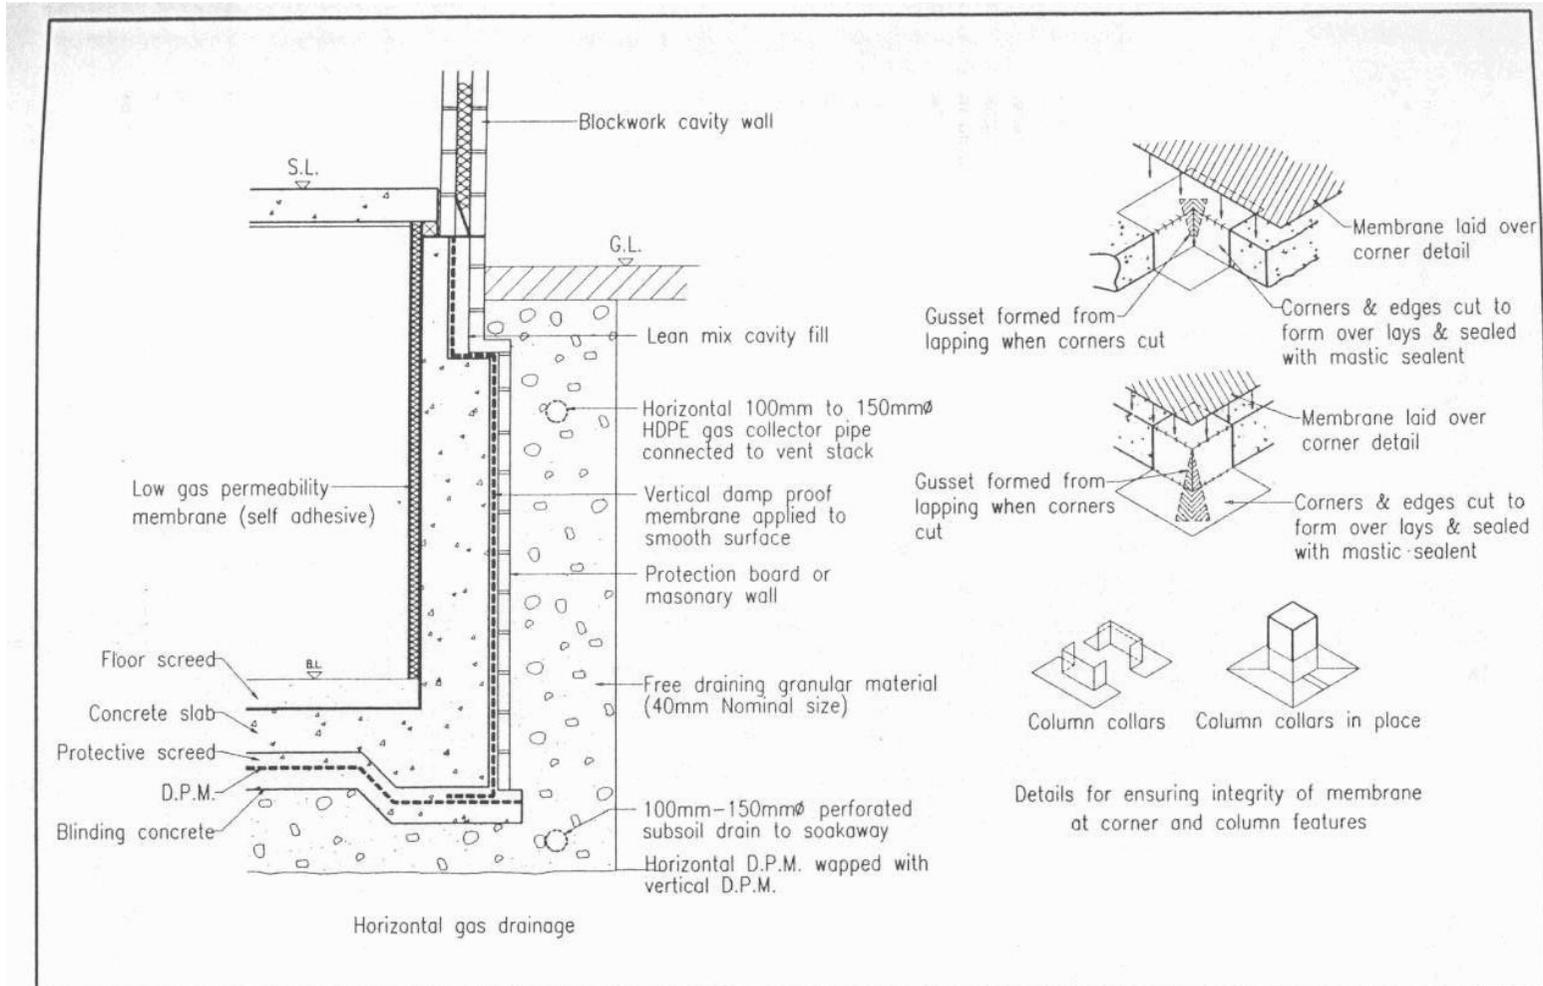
TYPICAL DETAILS OF FLEXIBLE MEMBRANE PROTECTION FOR BUILDINGS
